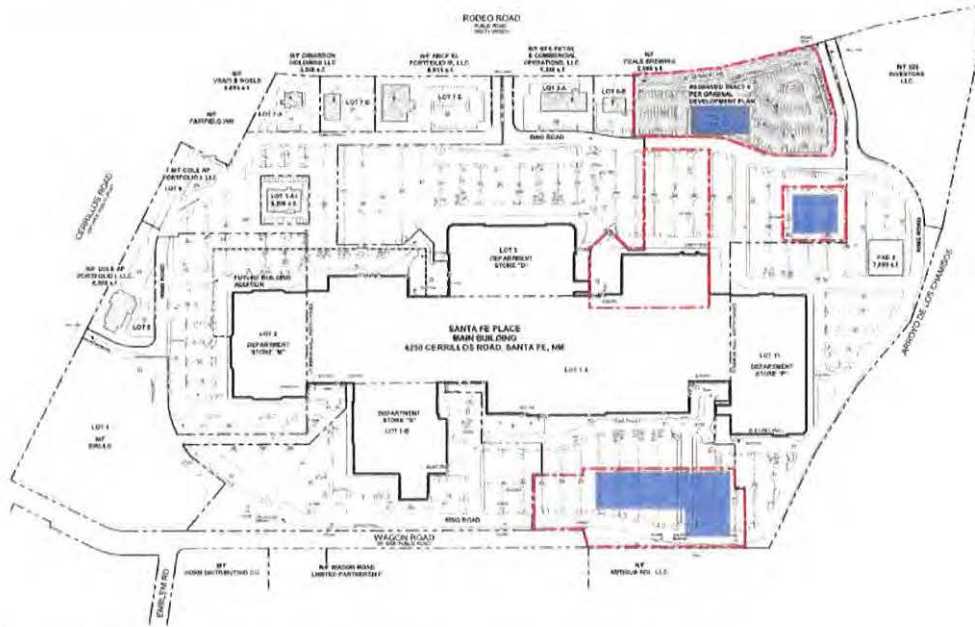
SANTA FE PLACE MALL PARKING UTILIZATION (SATURDAY, JUNE 10, 2017)
